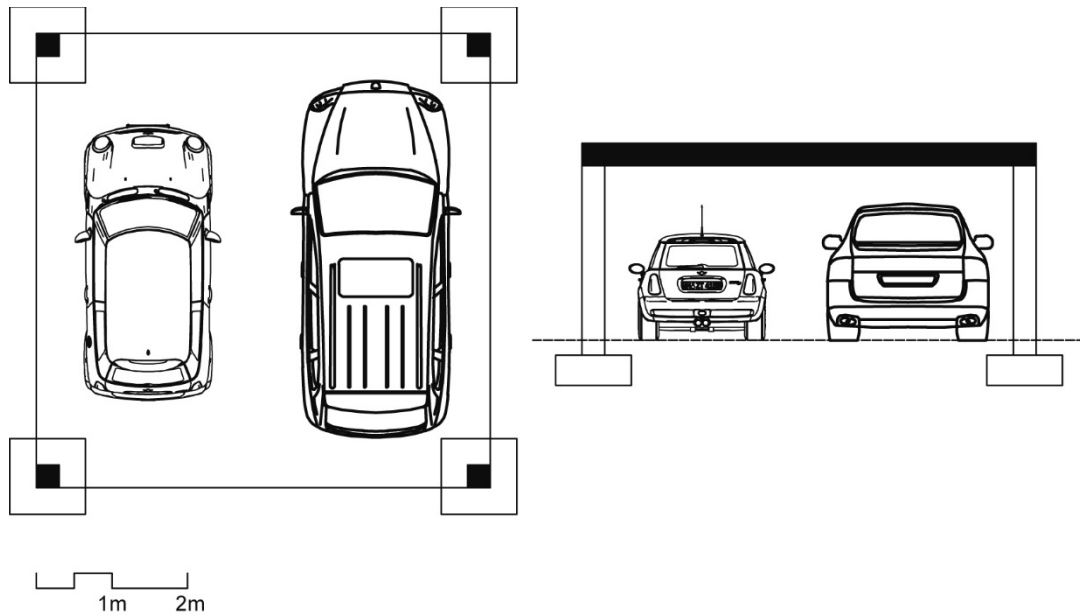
First design hypothesis: four columns placed in the corner sustaining a roof.
